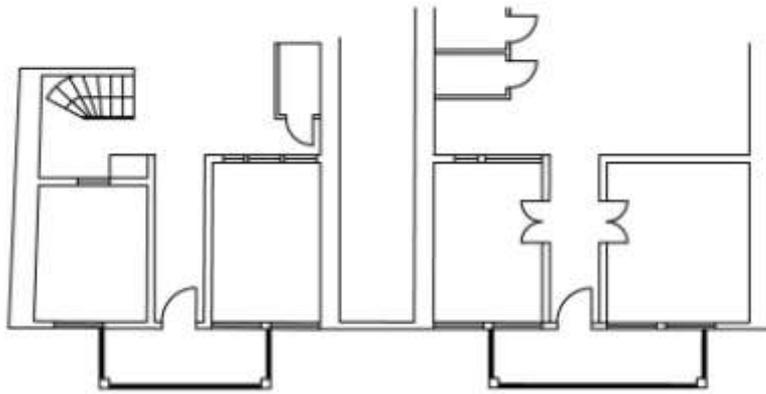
Basement floor plan of the house at 154 lot 24 parcel
